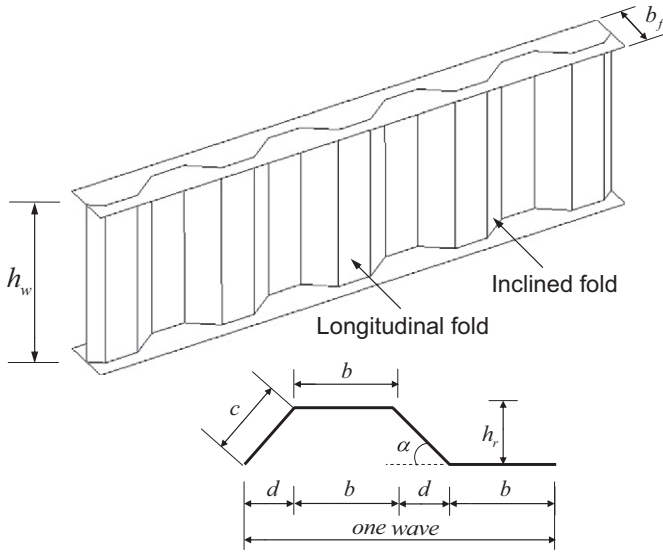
I-shaped girder with trapezoidal corrugated web (CWG).
